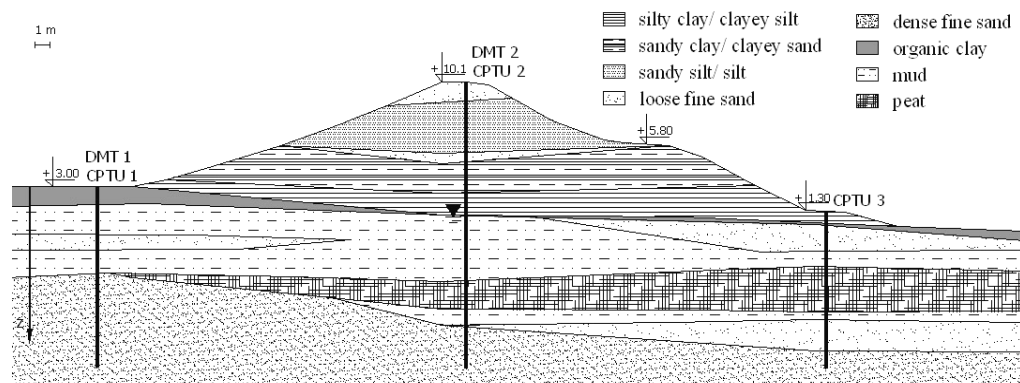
Flood embankment and its geotechnical cross-section, BALACHOWSKI [1]
